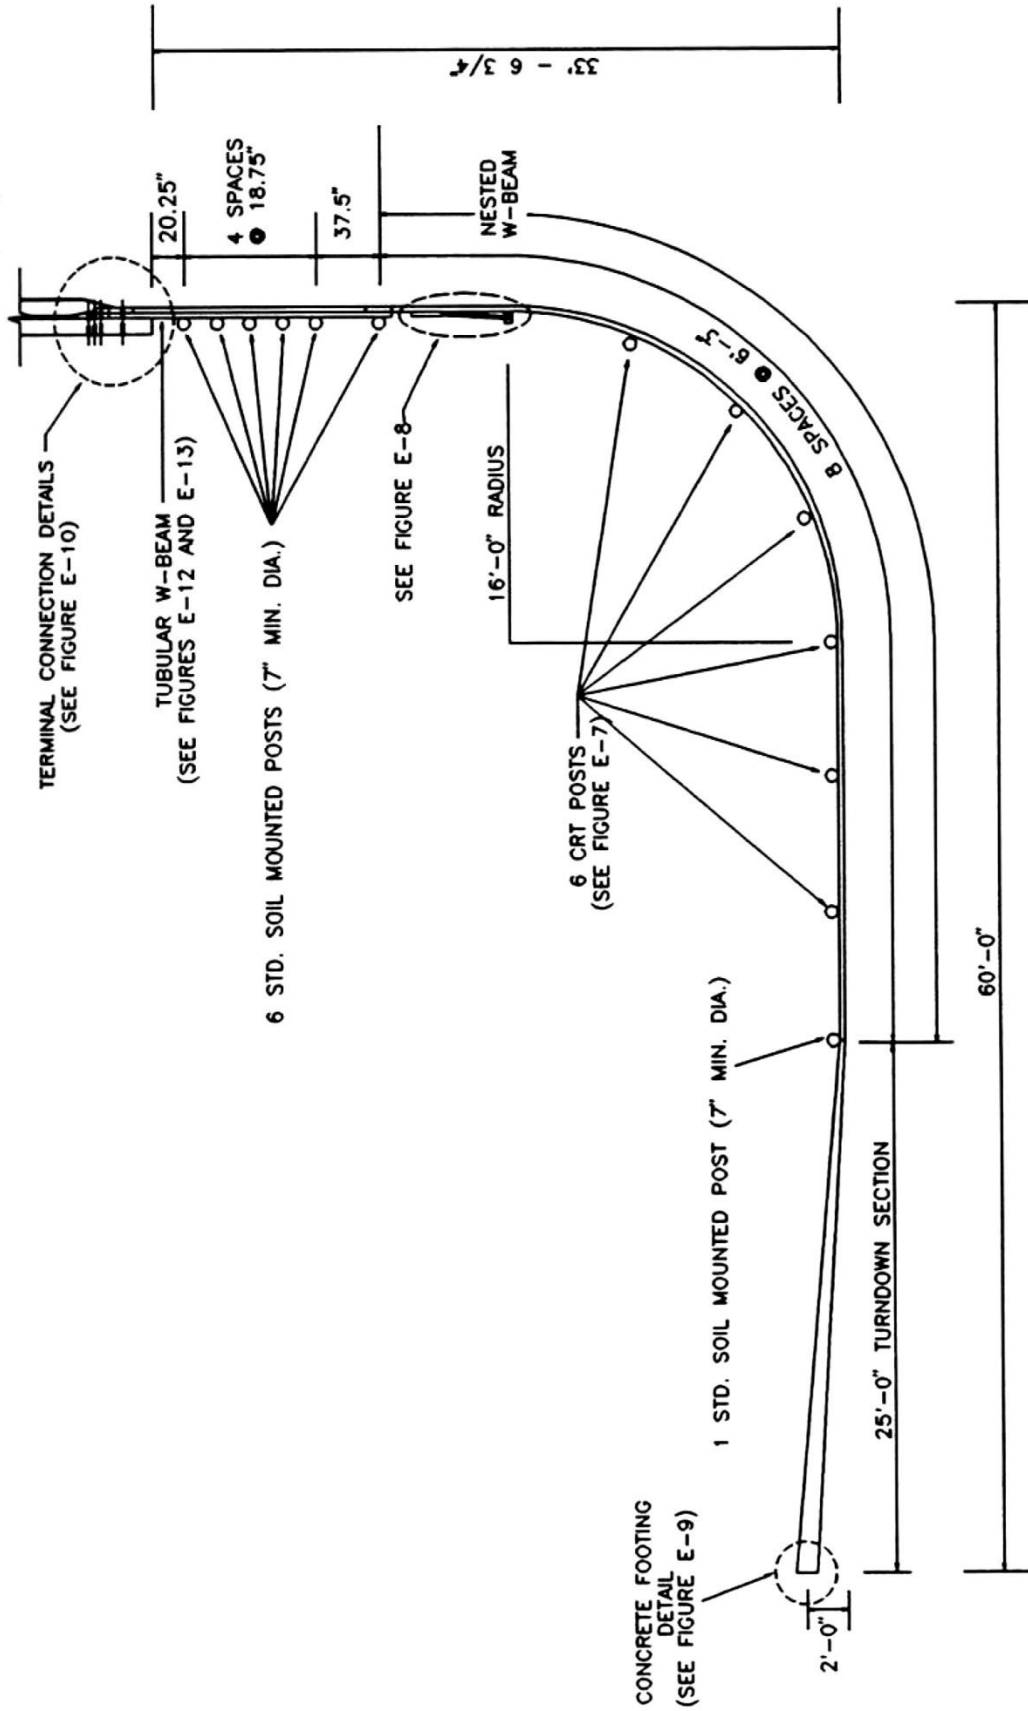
TTI W-Beam Short-Radius Guardrail System [10]
